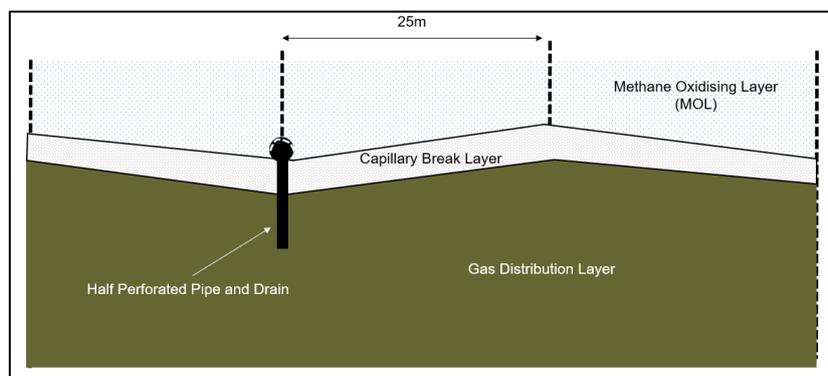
Design of Bioactive Trench – View on Long Section of Trench Showing Zig-Zag Capillary Break Layer
